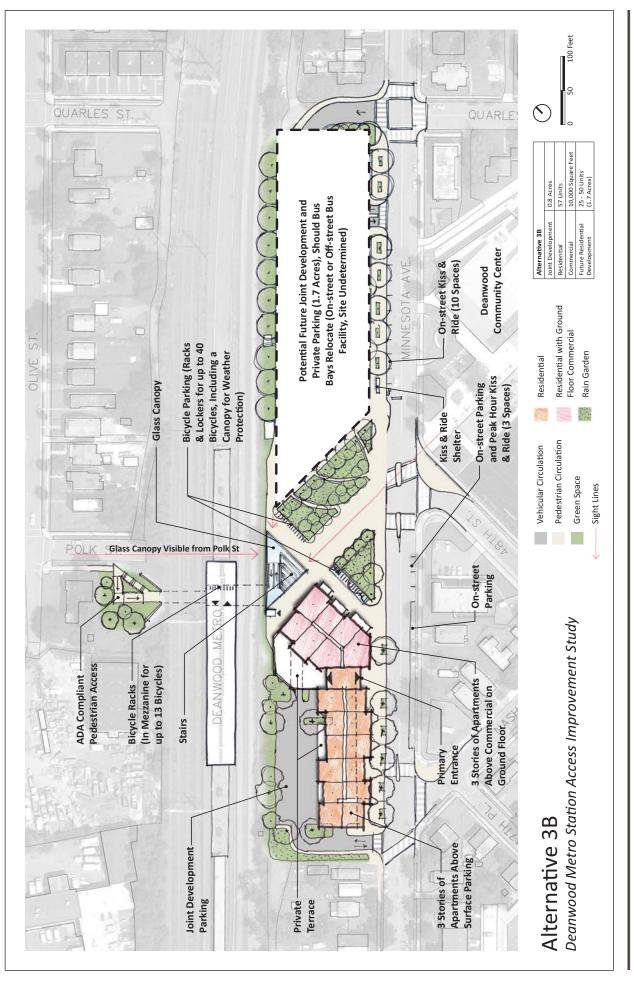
on the following page shows the Alternative 3B concept. The additional joint development would replace the relocated bus loop and 60-space Park & Ride. Joint development would comprise:
